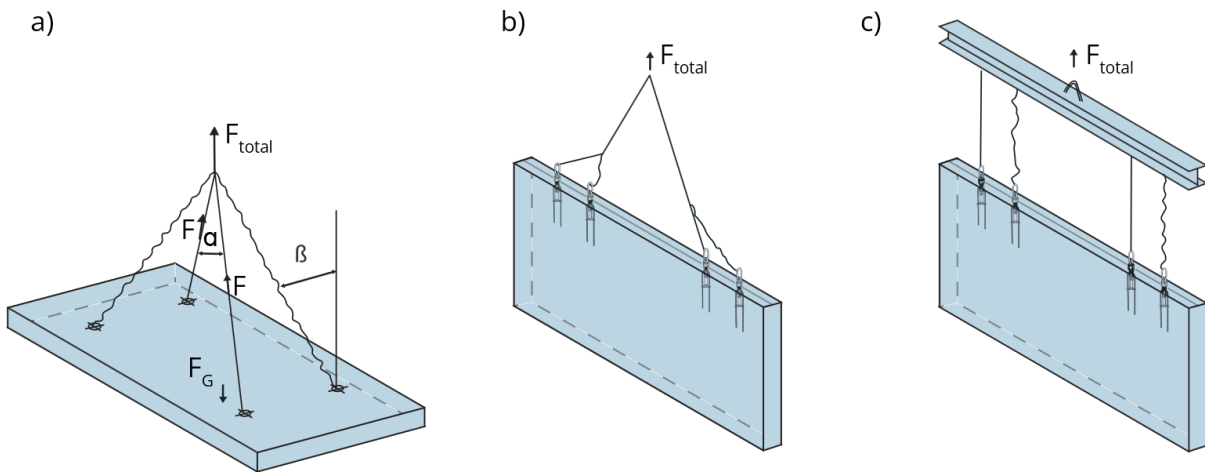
Examples of statically indeterminate lifting systems which should not be used
